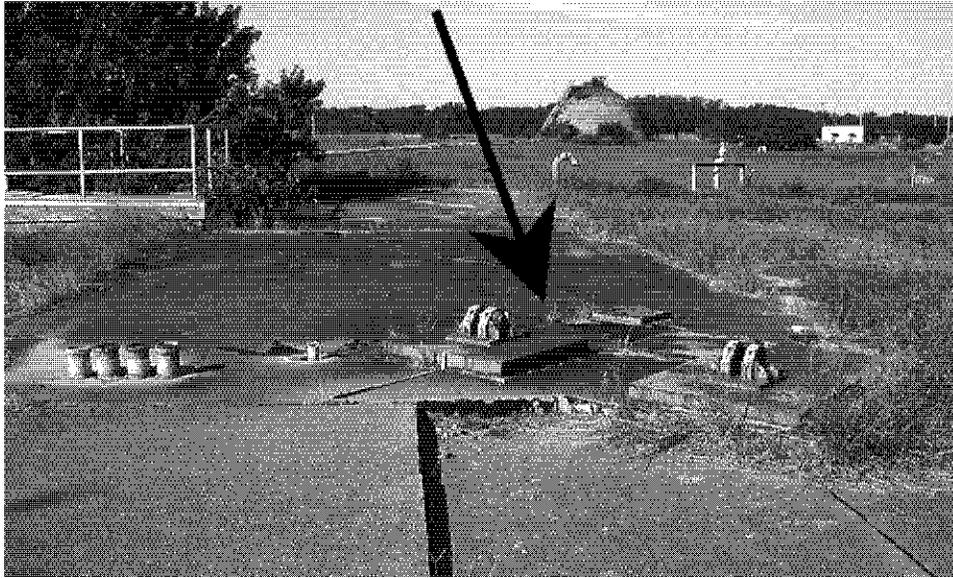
Pad 32 pad equipment room umbilical tower mounting (ERDC-CERL 2007).
